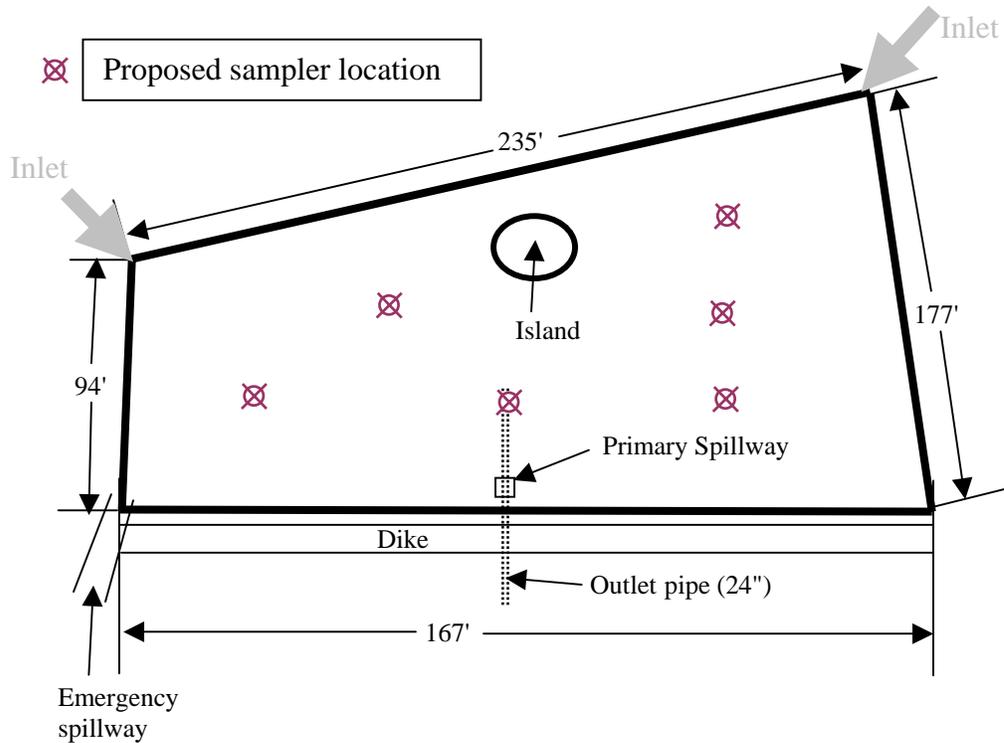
Schematic of Second Pond (Project ID: L_5.4/0.1) showing proposed locations of sediment traps.
